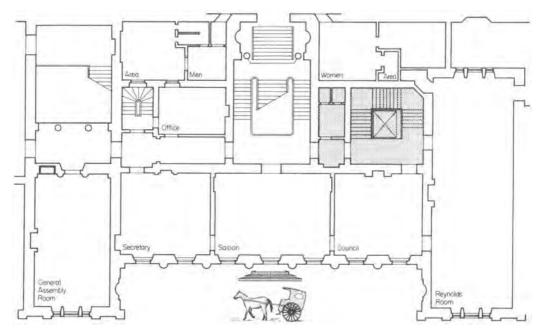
First Floor plan Royal Academy of Art's rooms.
